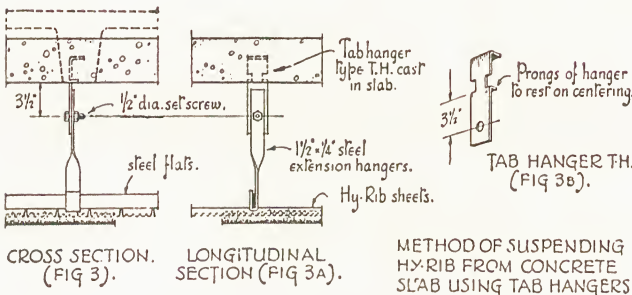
"Hy-rib" suspended ceilings. The ribs, which are pressed in the sheets, stiffen the ceiling and allow bearers to be widely spaced.
